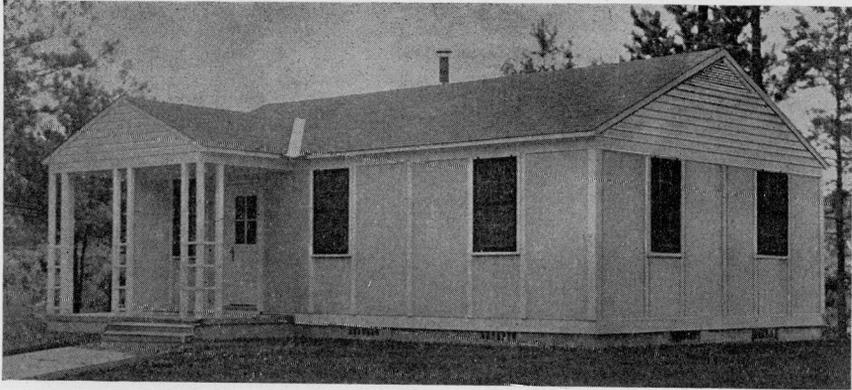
HOUSE BUILT OF SANDWICH PANELS.
